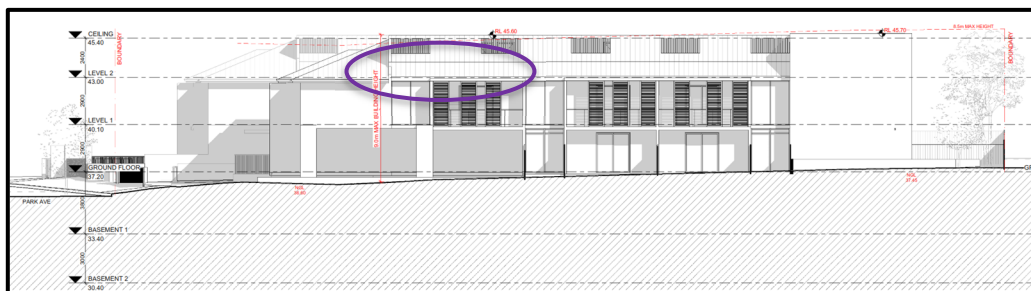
Extract of Eastern Elevation showing maximum height in the south-east corner of the building
